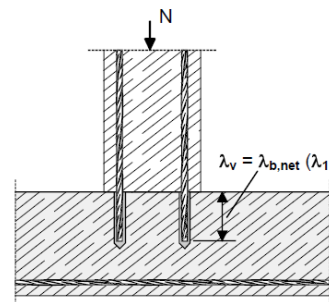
Rebar connection for components stressed primarily in compression. The rebars are stressed in compression
